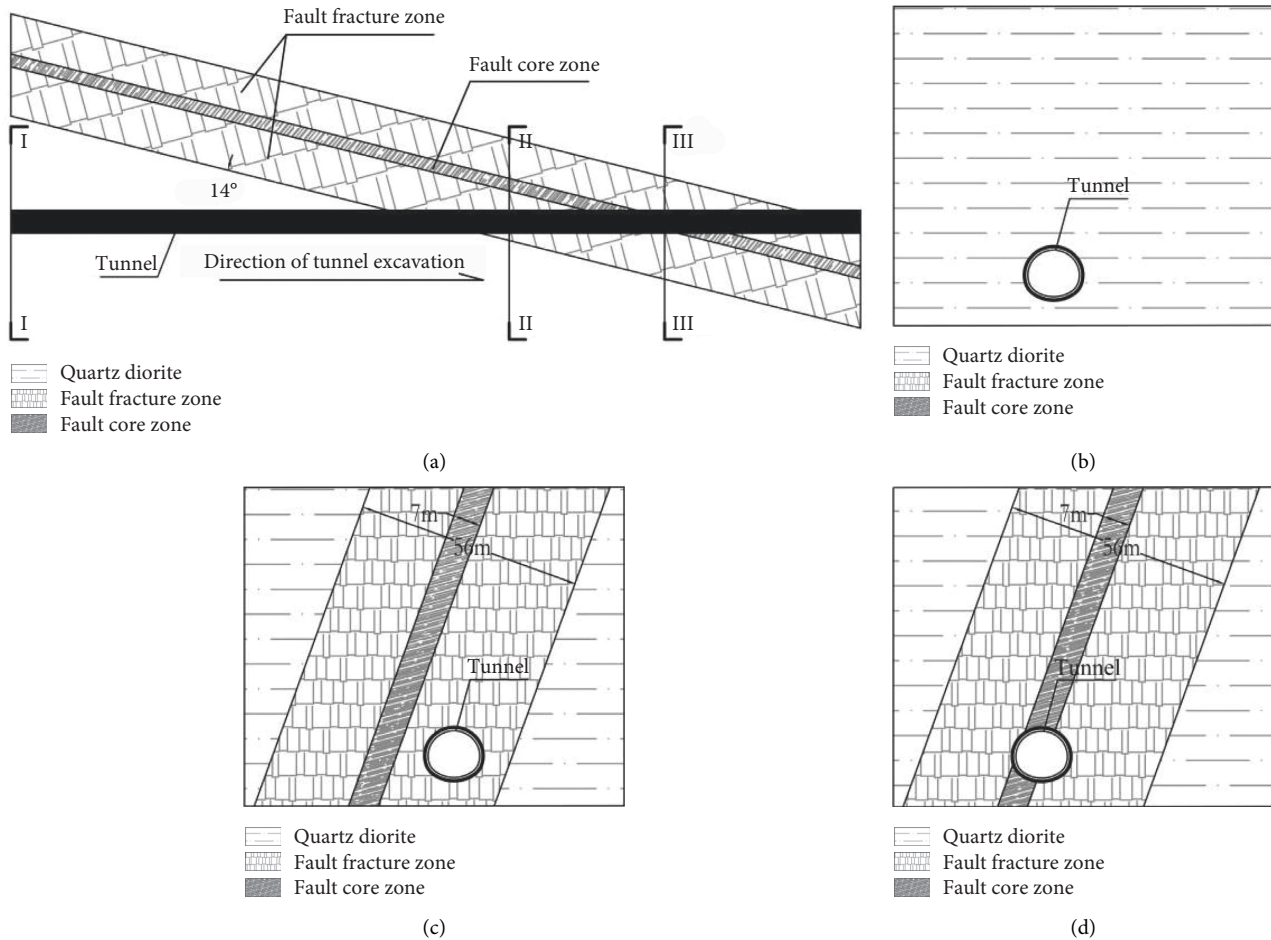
Plane schematic diagram of tunnel crossing fault zone. (a) Cross-section. (b) I-I profile section. (c) II-II profile section. (d) III-III profile section.
